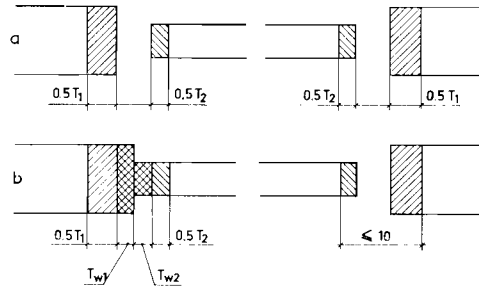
Loose fit B (see text) for two groups of components of dimensions with tolerances: (a) without and (b) with assembly tolerances.
